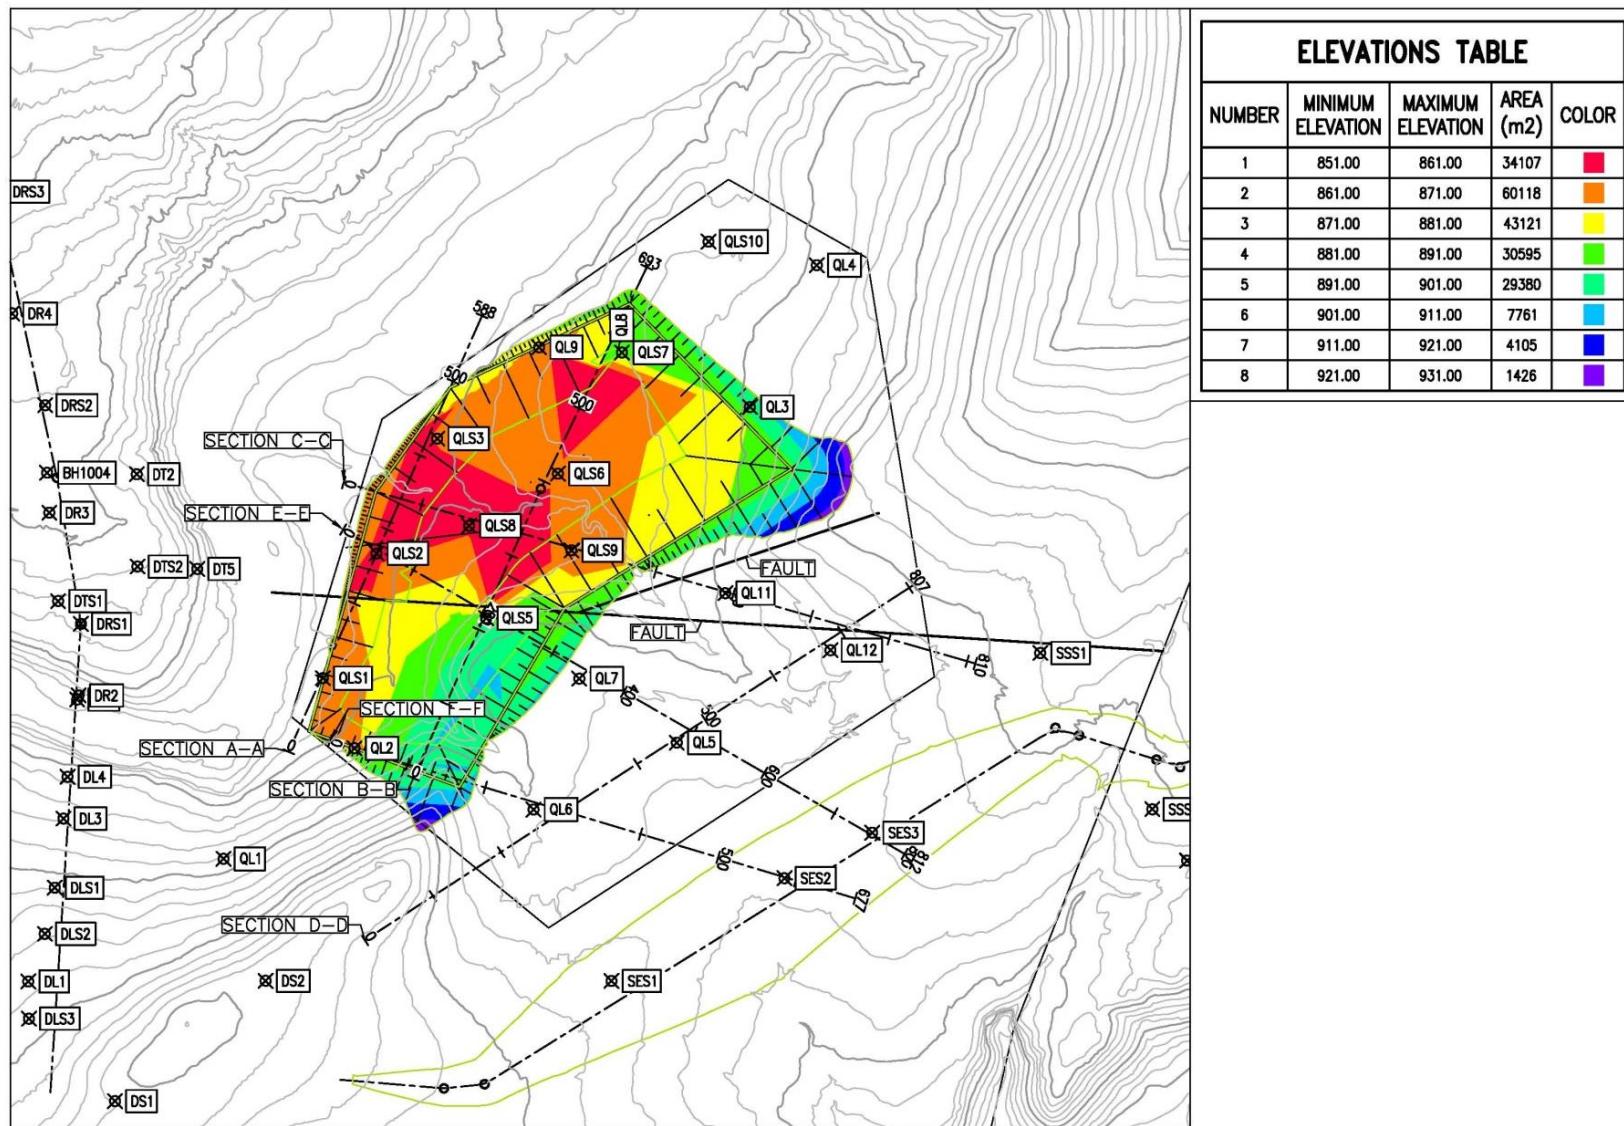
G.1: Plan layout of Quarry I with cross sections and proposed development (1)
